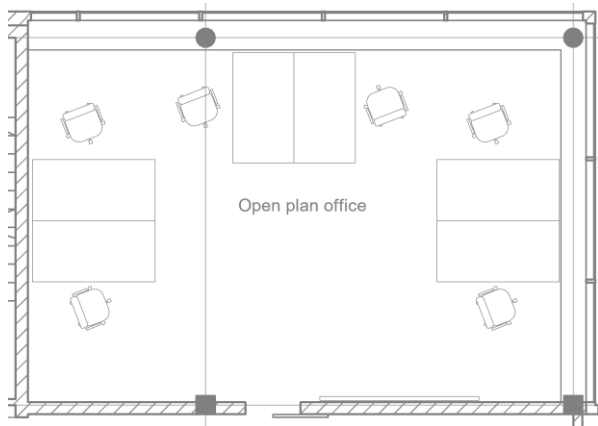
Floor plan of an open-plan office with 6 workplaces.
